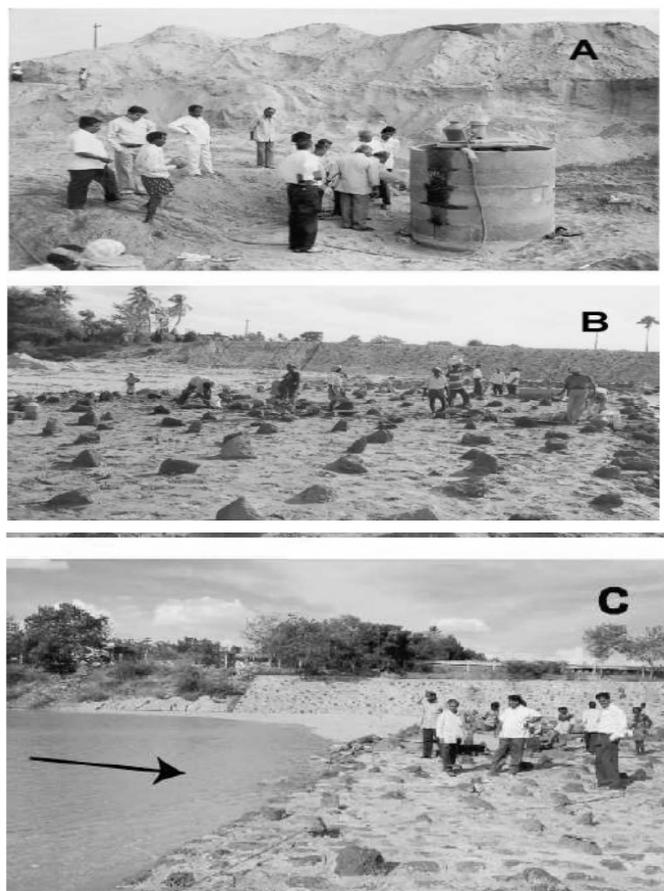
Construction of Jack Well upstream side of SS Dam (A); Check Dam above the SS Dam (B); Impounding of River Water (C).
